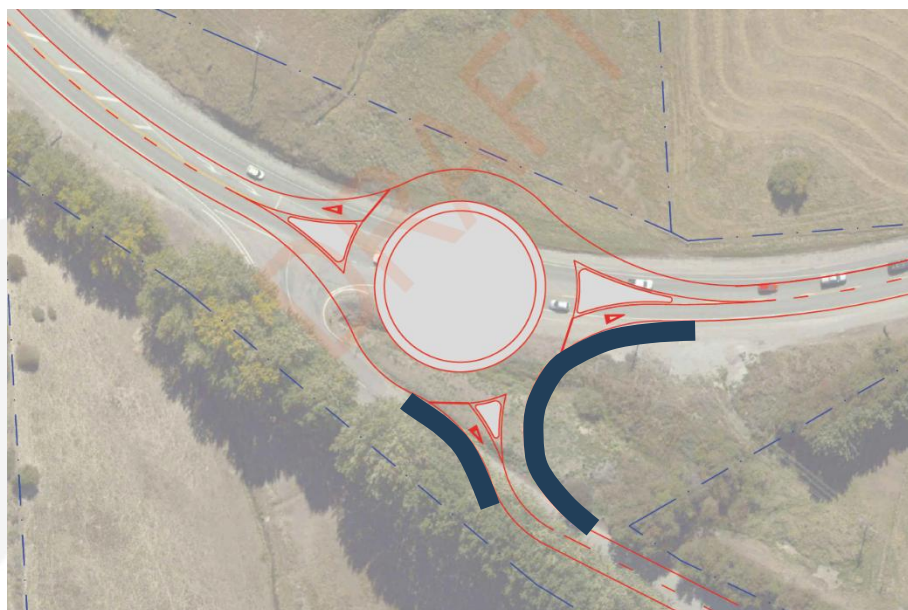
Proposed Roundabout Layout at State Highway 6 / Morven Ferry Road Intersection Illustrating Second Approach Lanes within Legal Boundary
